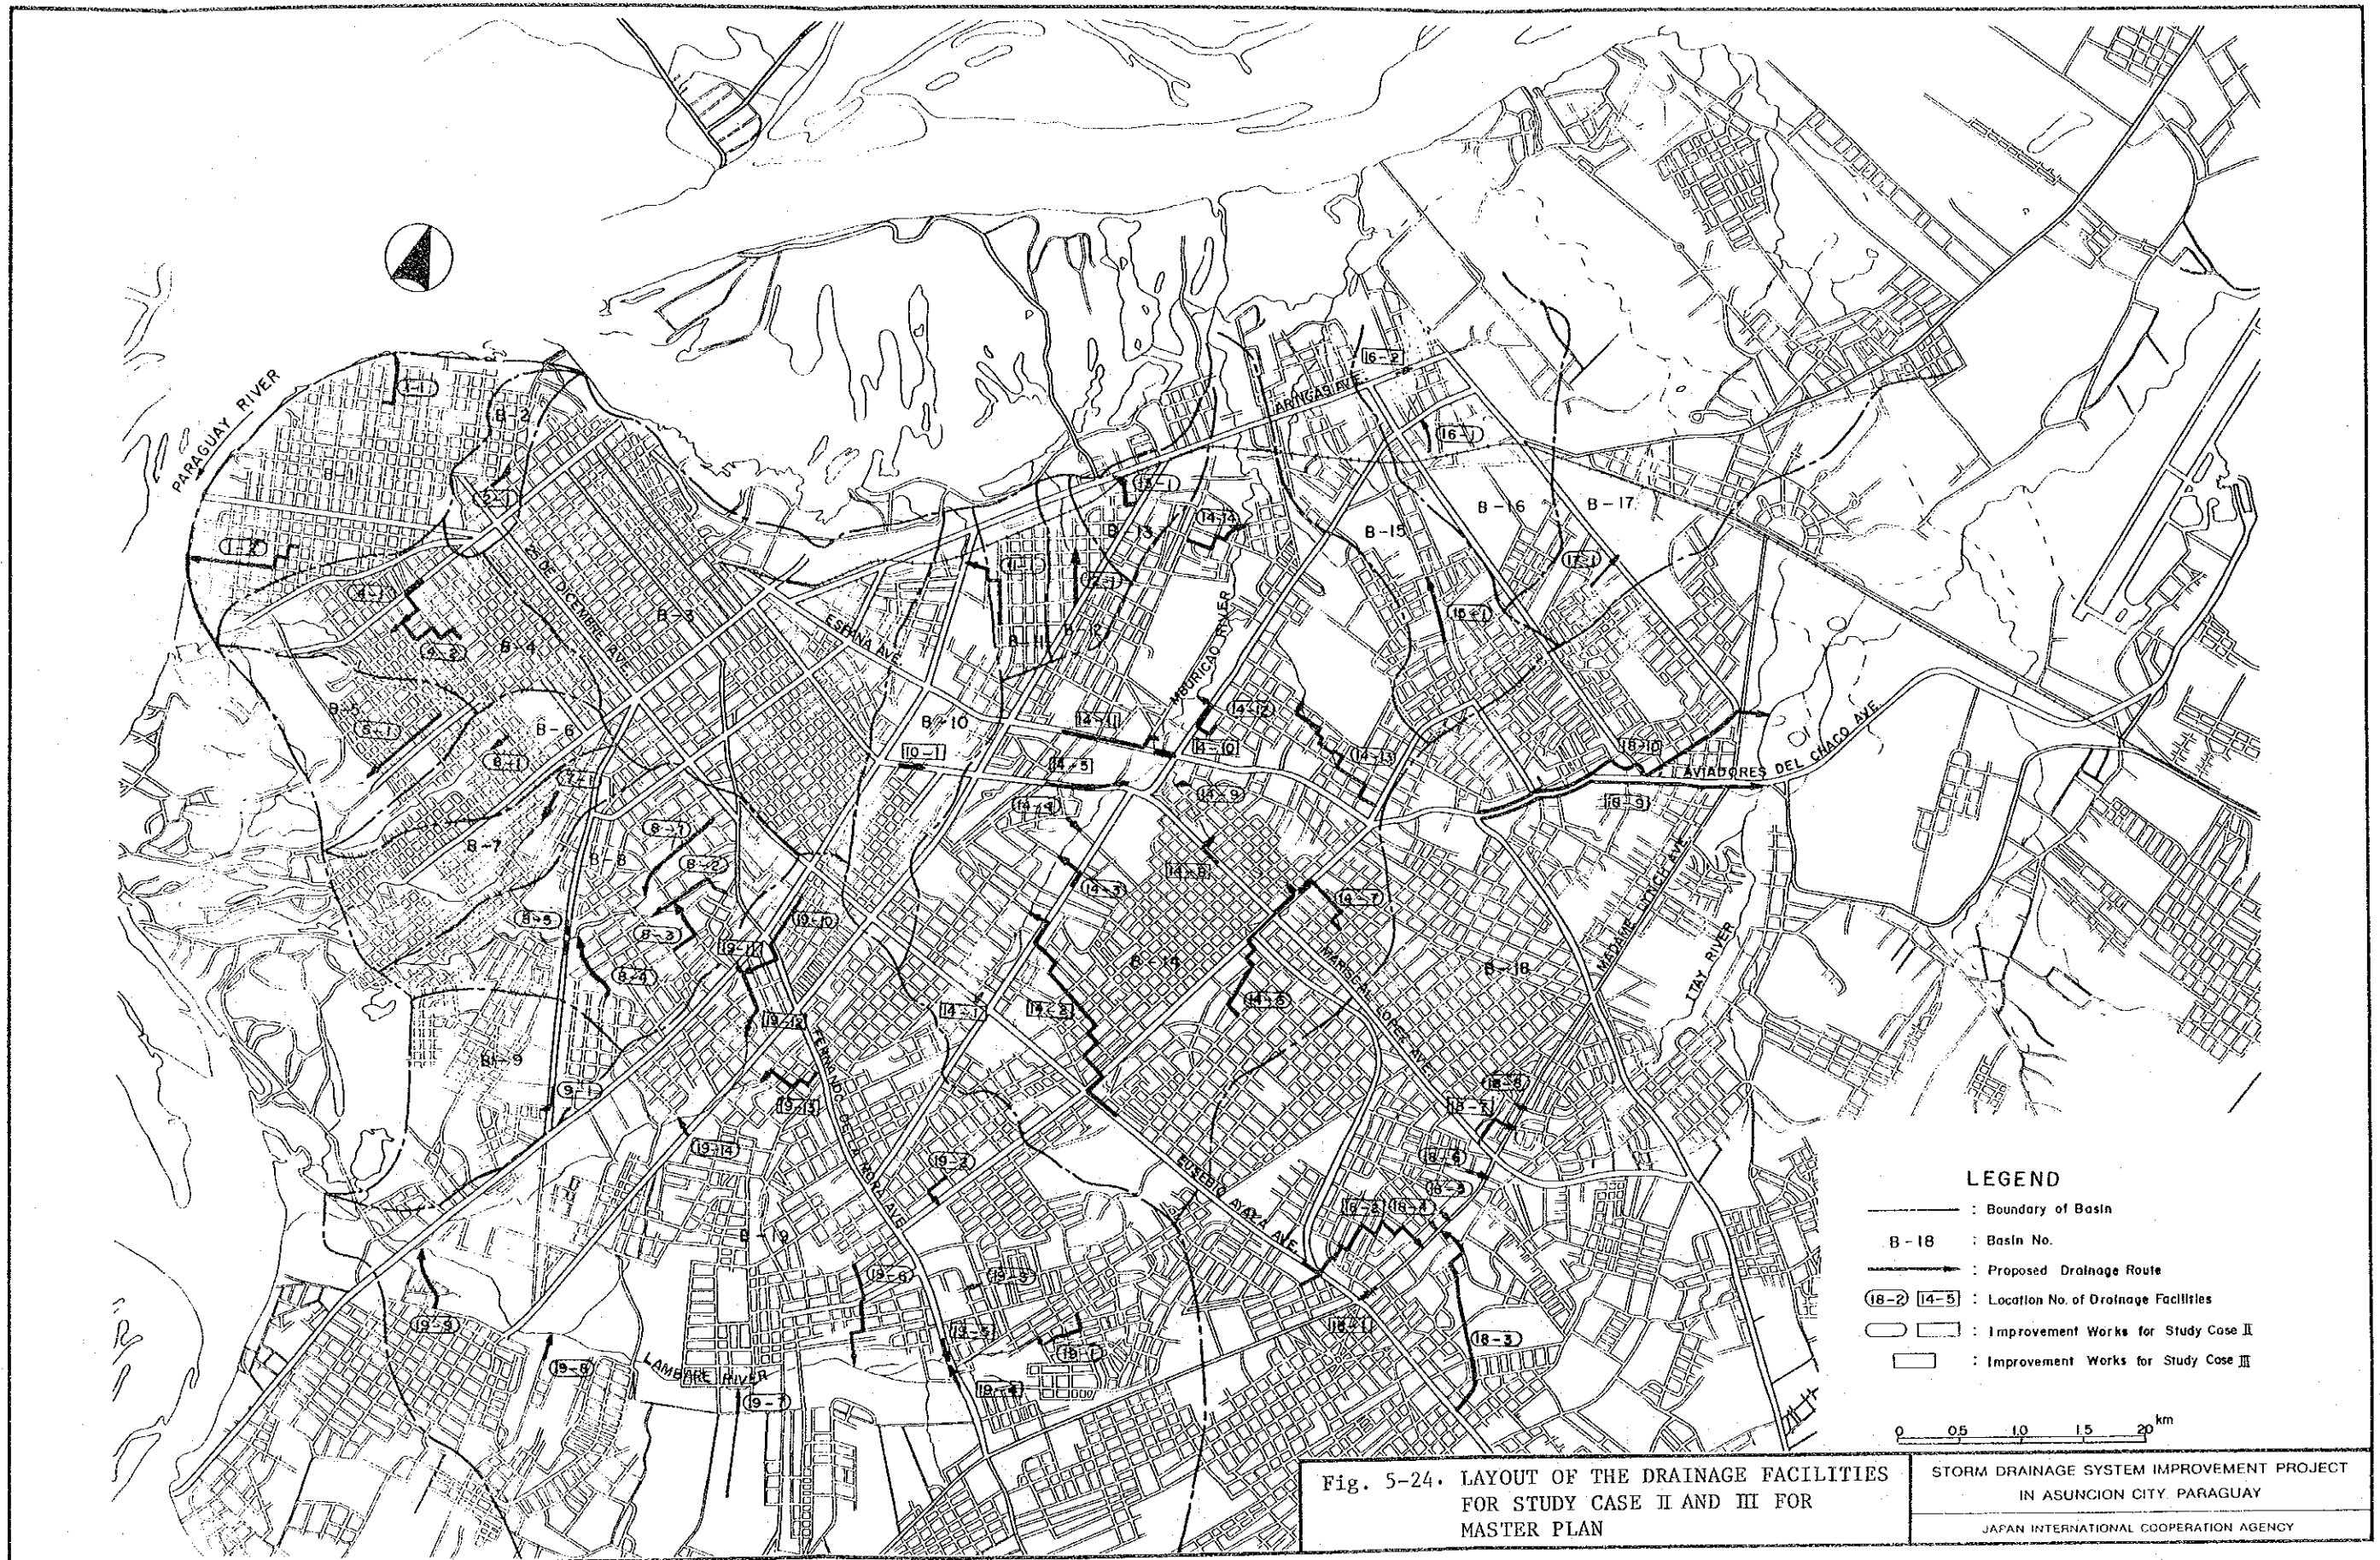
LAYOUT OF THE DRAINAGE FACILITIES FOR STUDY CASE II AND III FOR MASTER PLAN
